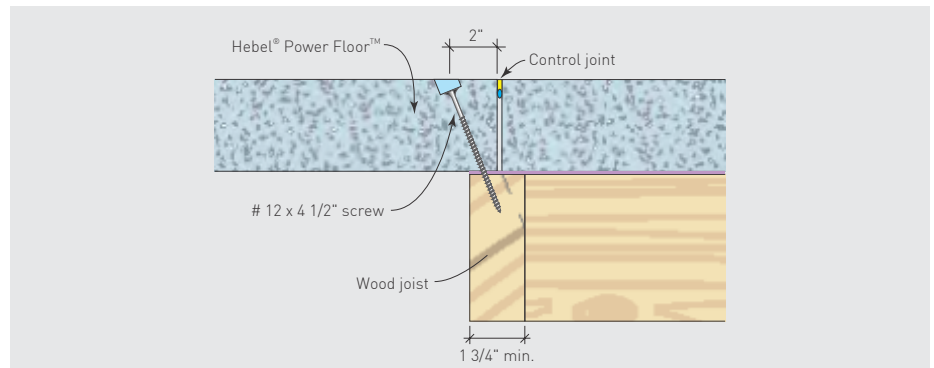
Fixing to Timber Joists at change in Joist Orientation.
